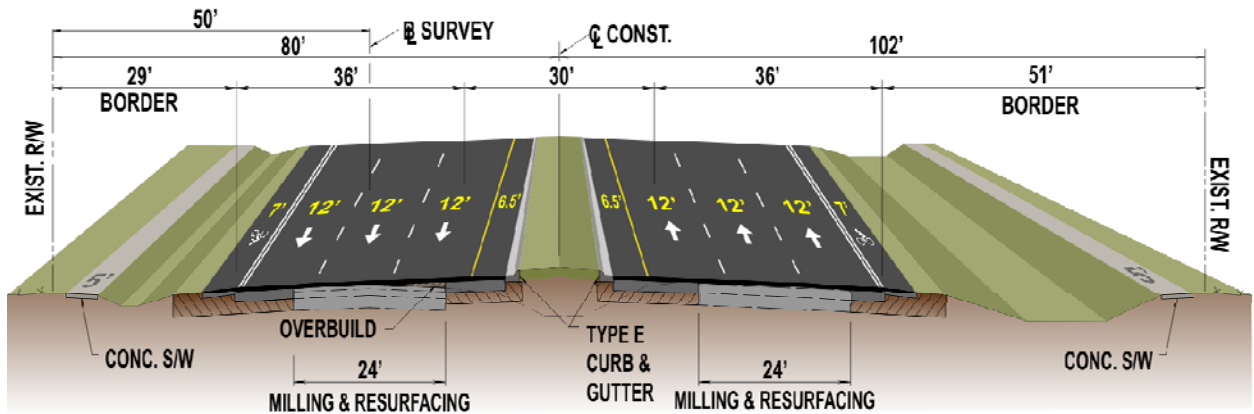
URBAN NEW CONSTRUCTION TYPICAL SECTION (SEGMENT 2B)
